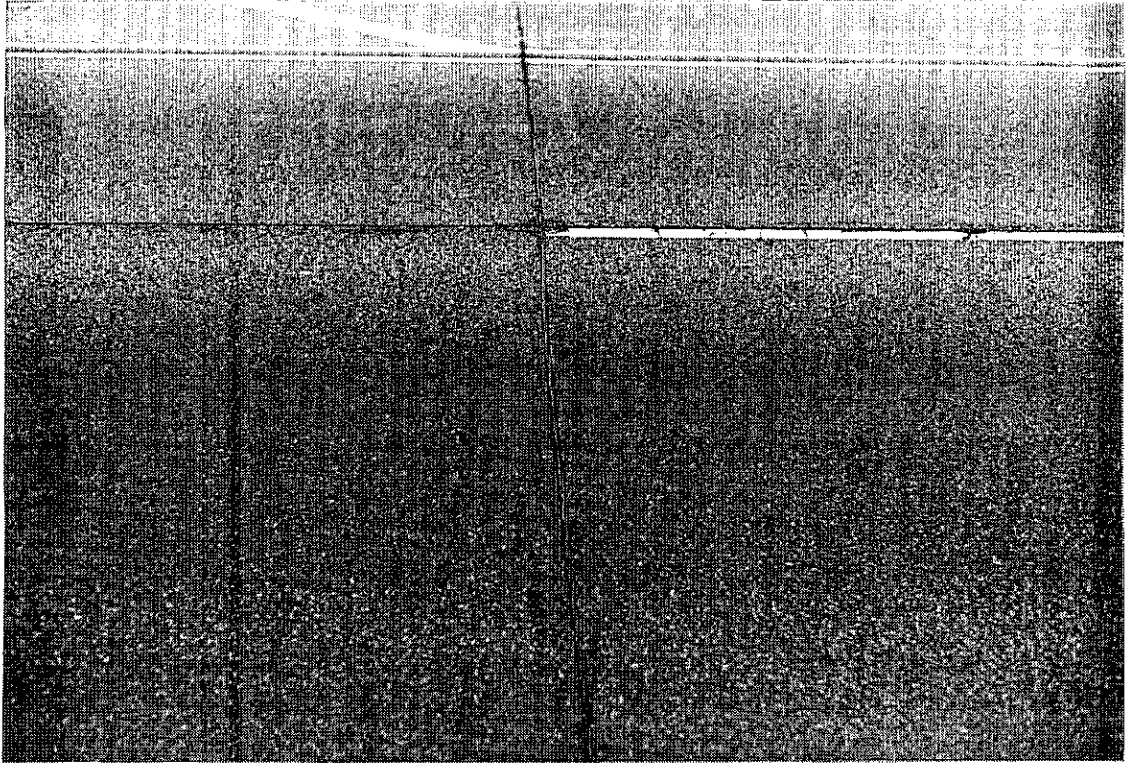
Sealant pulling away from walls of Design B joint with 40-foot spacing.
